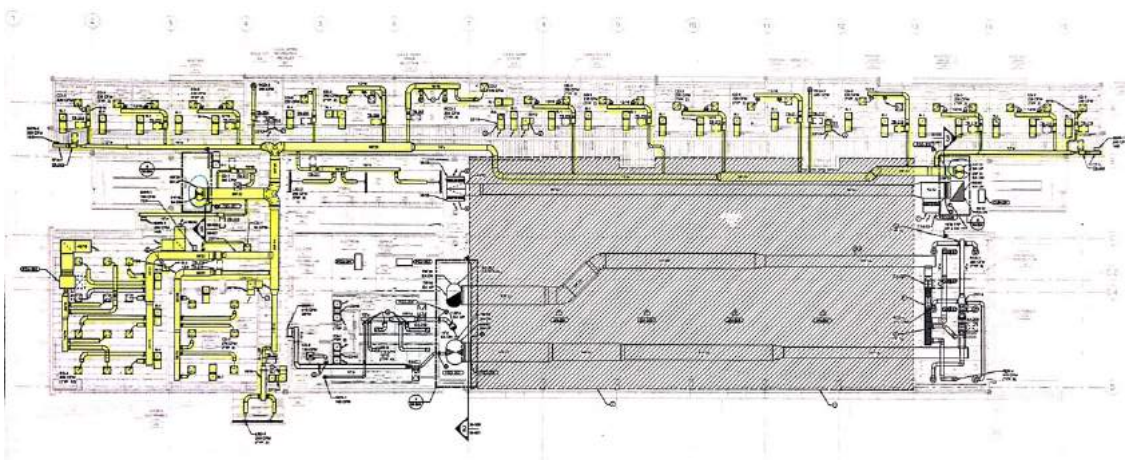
AHU3 system – Second floor (Source: Architectural plans)
